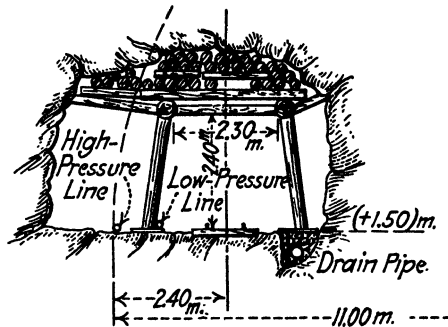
TIMBERING OF THE BOTTOM HEADINGS, AFTER WIDENING.
